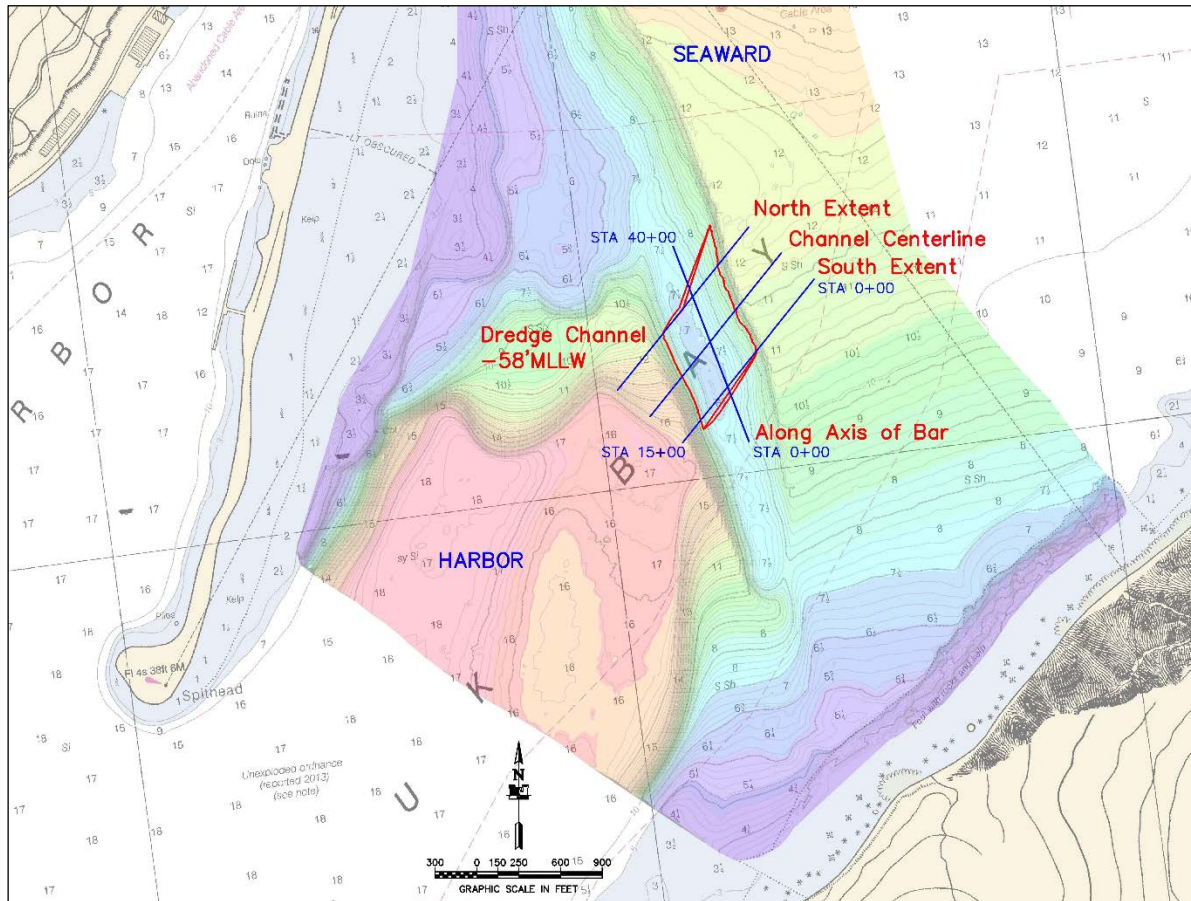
Plan View of Dredge Channel at -58 feet MLLW Depth
